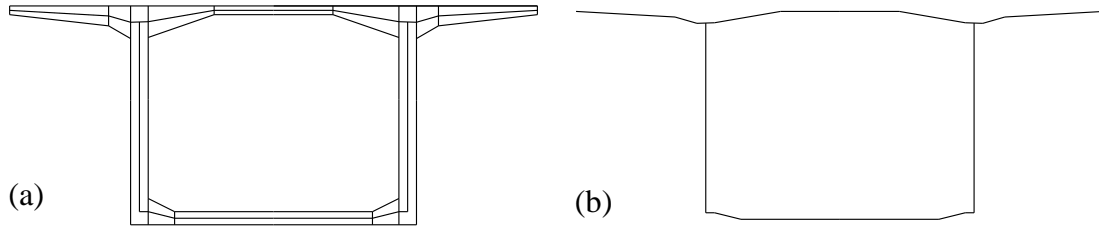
Layout and dimensions of stiffened steel box section (unit: mm)
